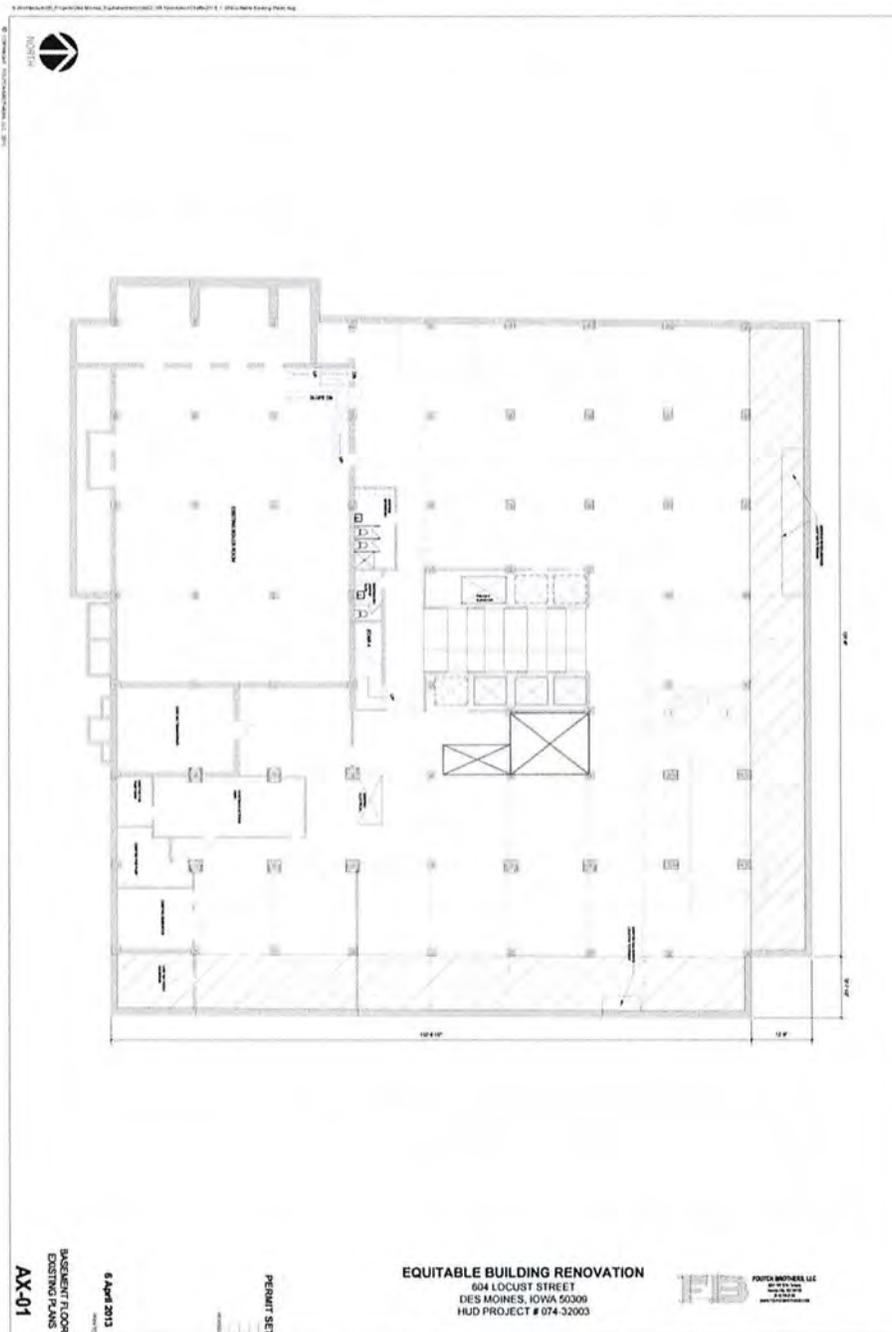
Basement Floor Existing Plan, drawn by Fouch Brothers, LLC from field measurements
